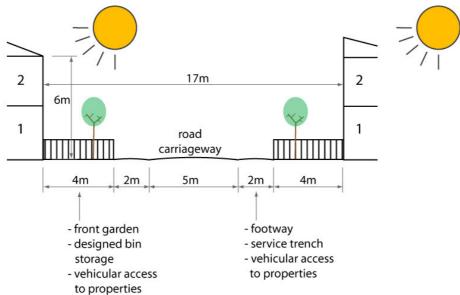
Tight streets may be used but not for long stretches (as no room for street trees) and only 2 storey buildings suitable.
